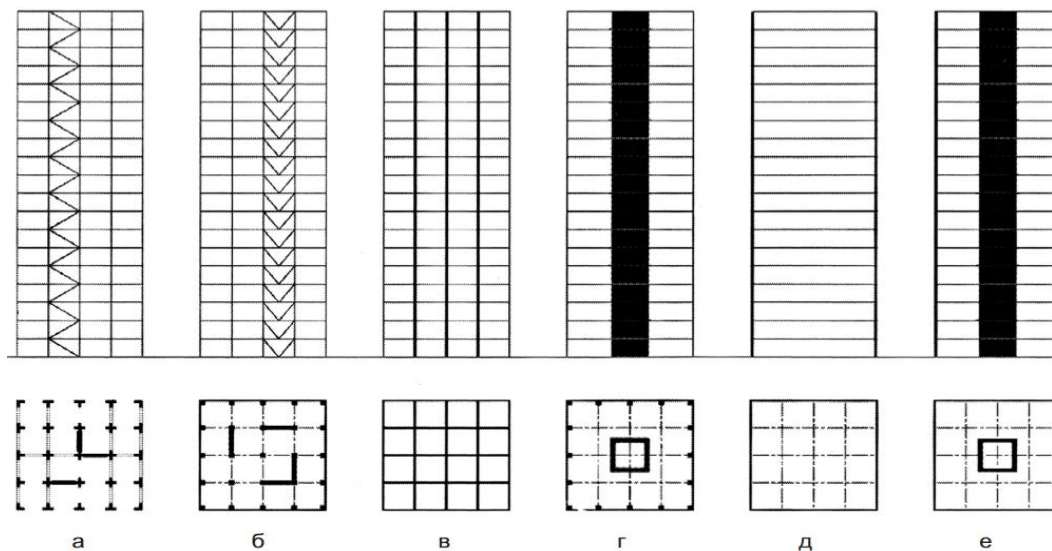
Structural systems of high-rise buildings [1] : a - frame and link; b- frame with rigidity diaphragms; c- frameless with bearing walls; d- stem system; e - box; f- stem boxed
